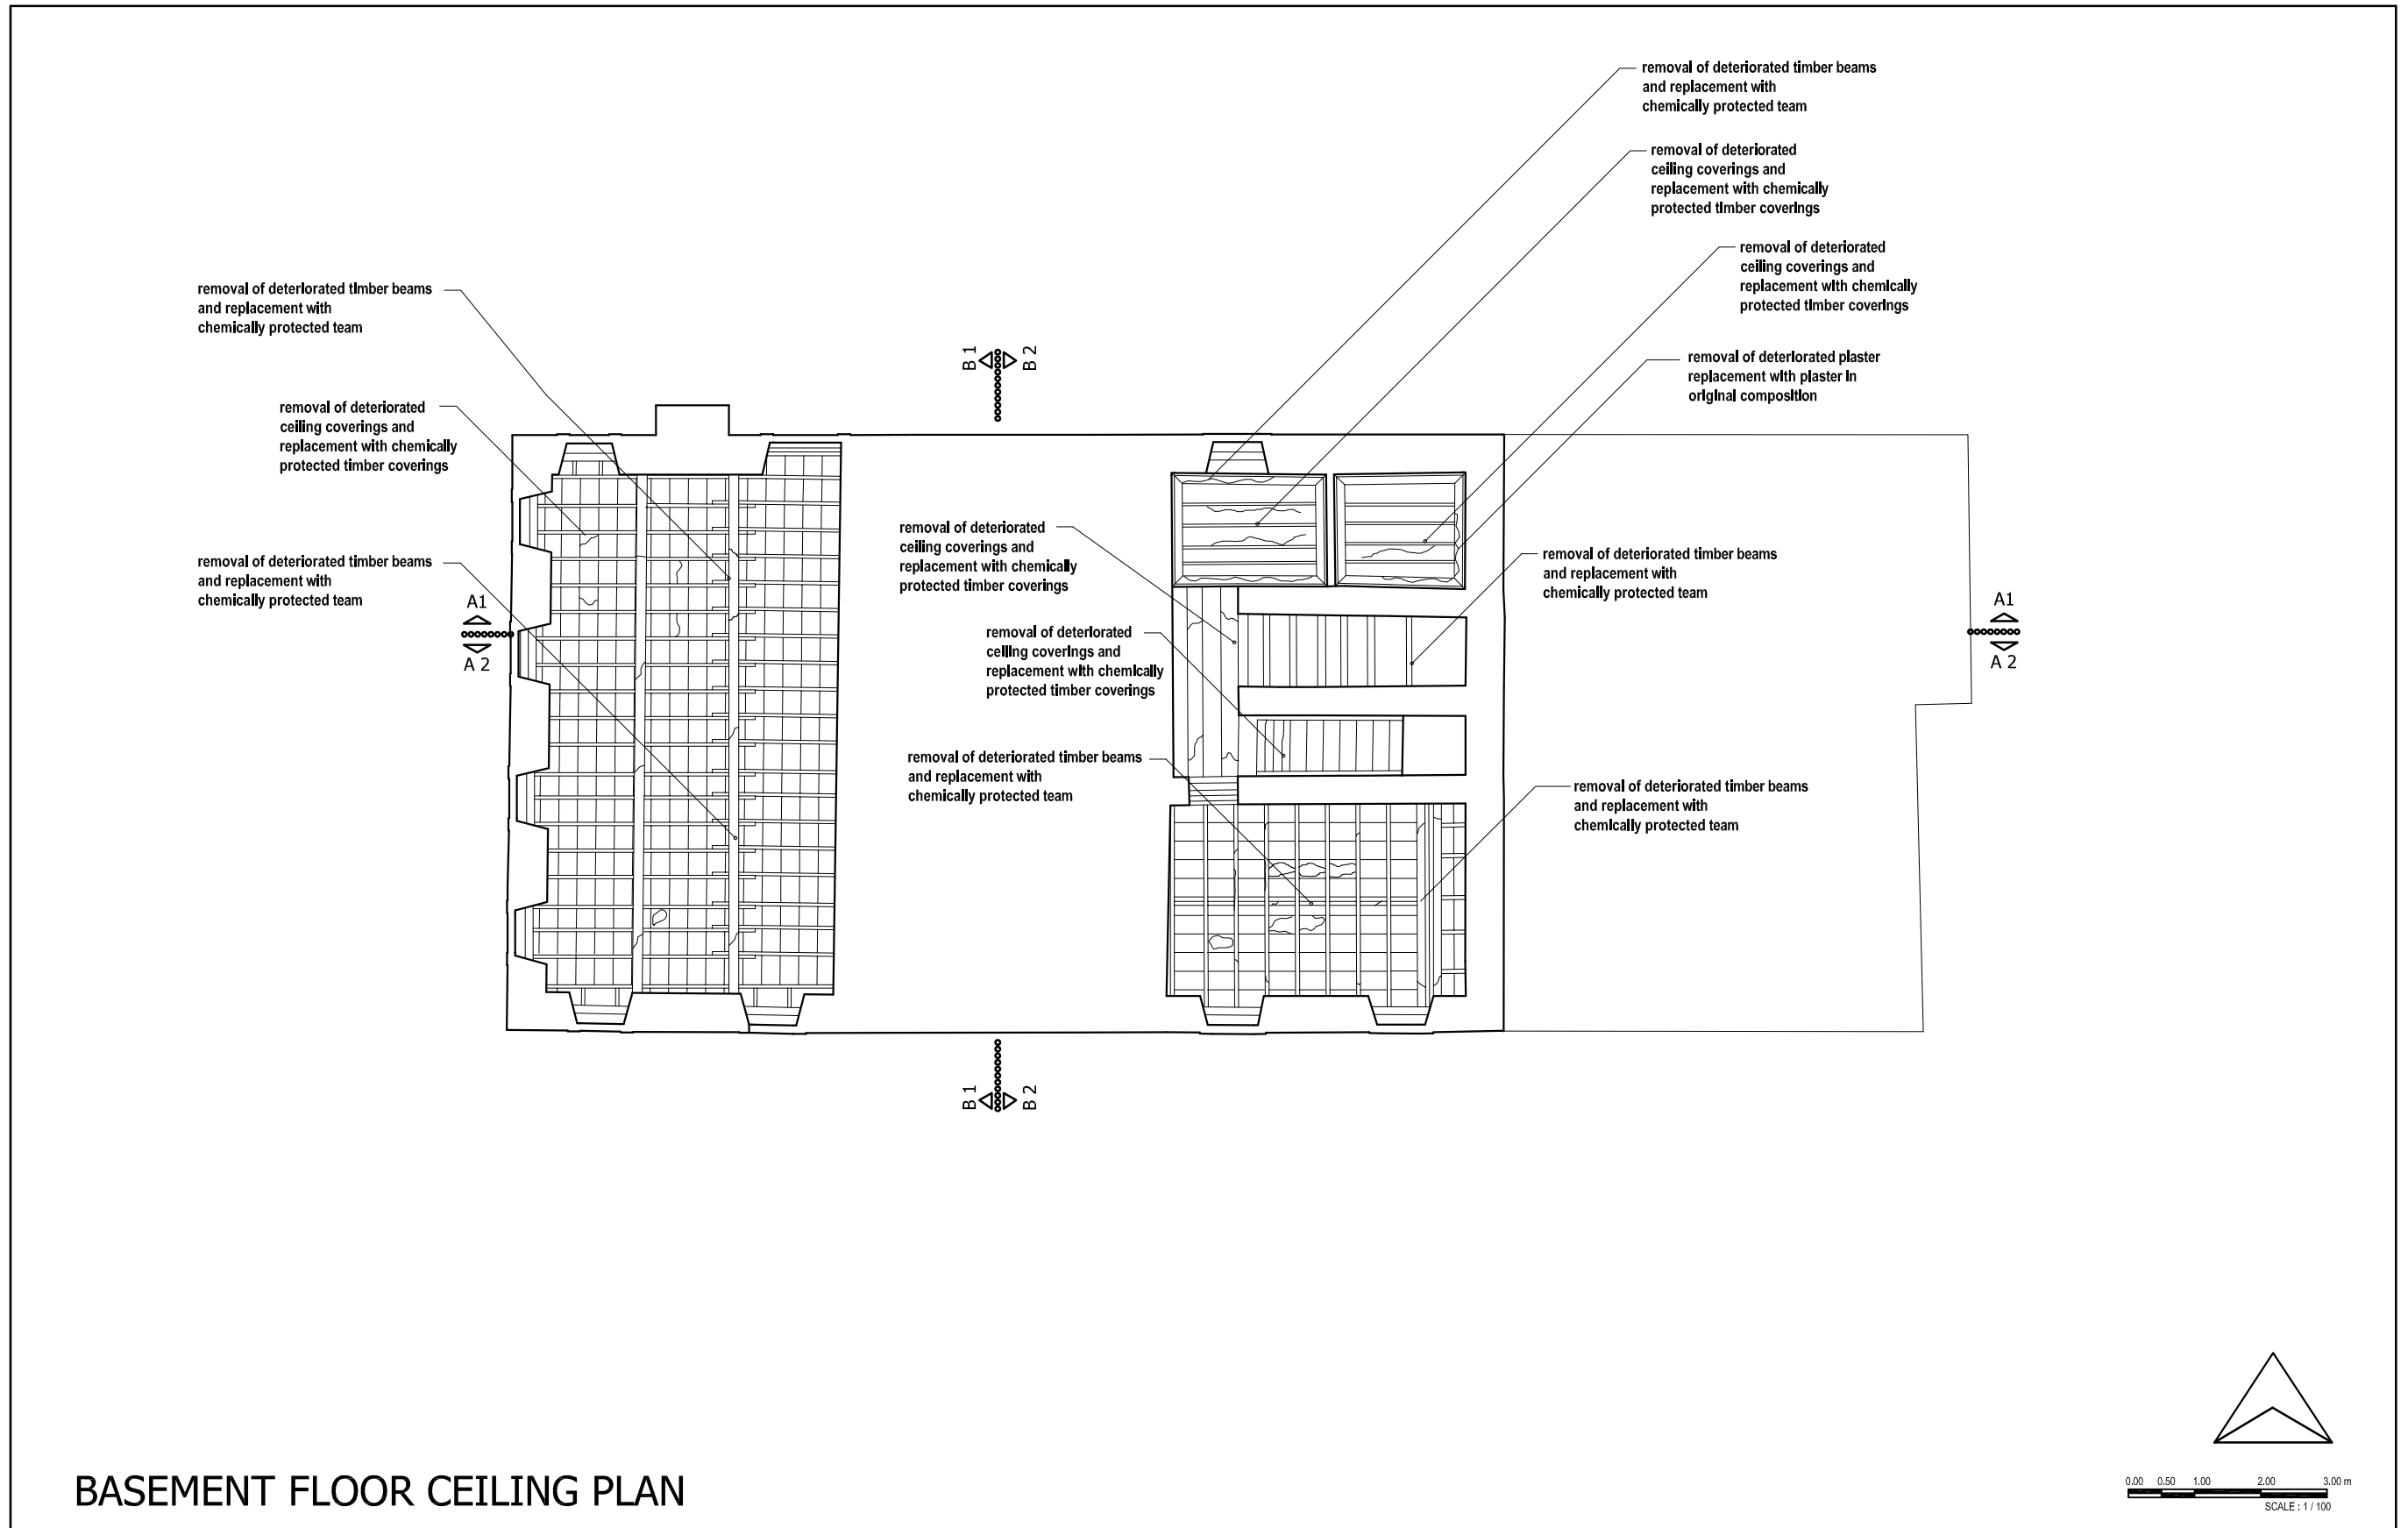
Remedial Measures for Structural Damage and Material Decay- Basement Floor Ceiling Plan
